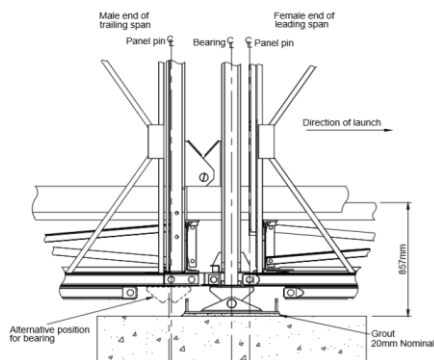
Span junction equipment, adapted from Mabey Bridge (2014)
